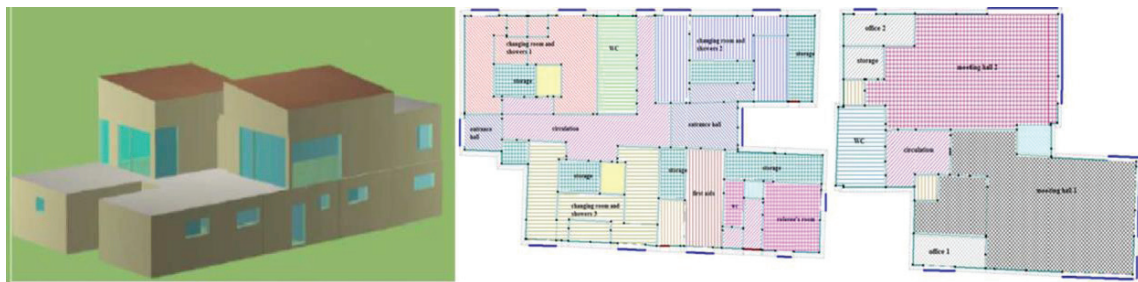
(a) 3D building base case model; (b) first and second floor zoning
